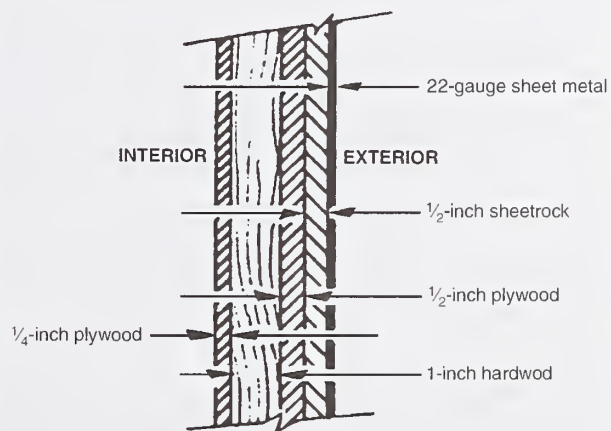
Recommended construction of an IME container using 22-gauge sheet metal.
